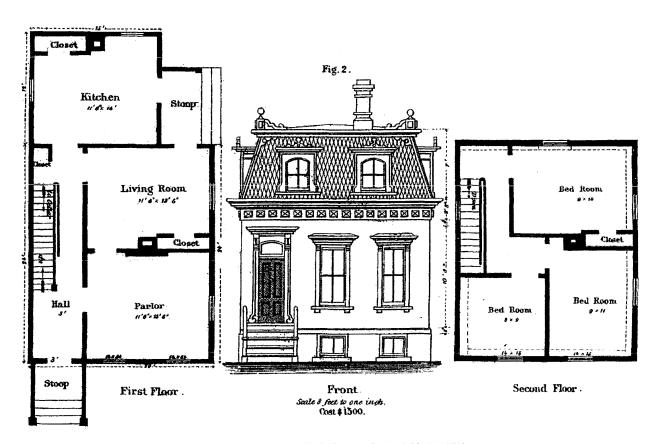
From Blicknell's Village Builder and Supplement, 1872 (Source: Bicknell 1976 (1872)).
